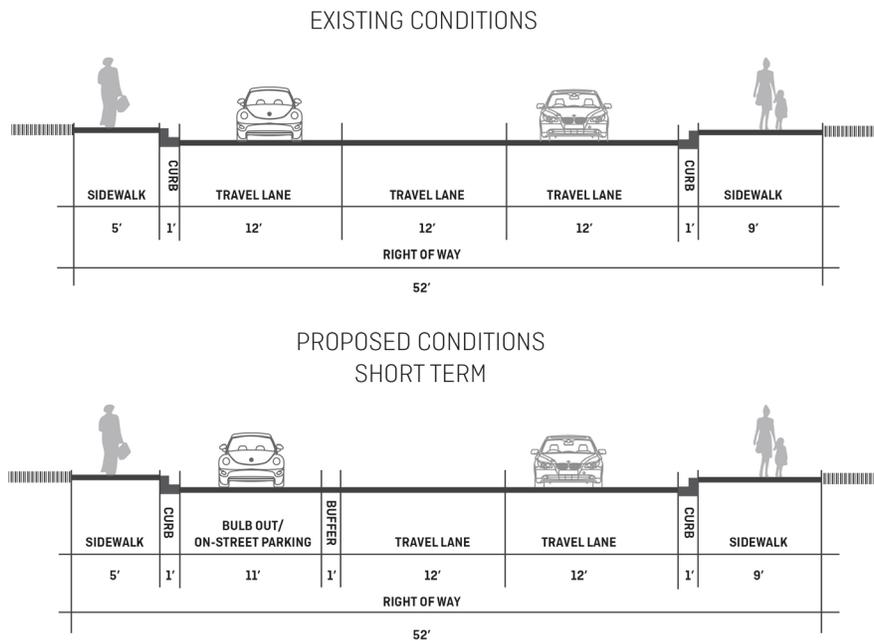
Willard Street at Florida Avenue (West Bound)
